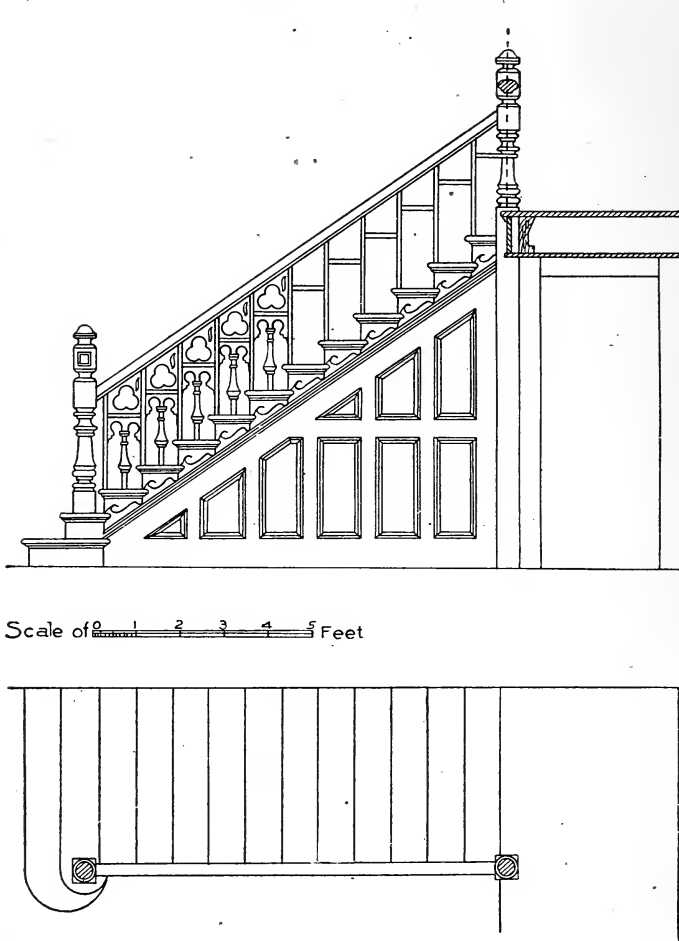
Elevation and Plan of Stair with Bullnose Tread.
